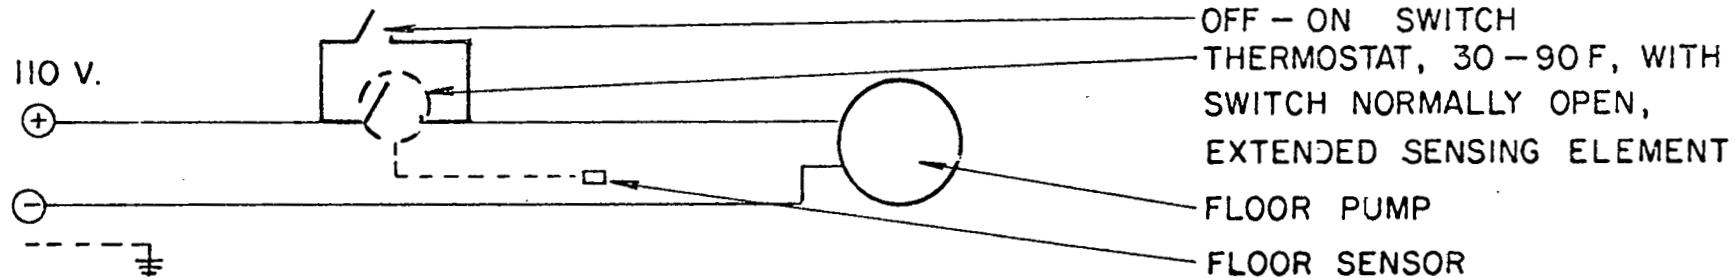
Controls for pumps and shop fan installed in a machine storage building having a solar collector roof.
